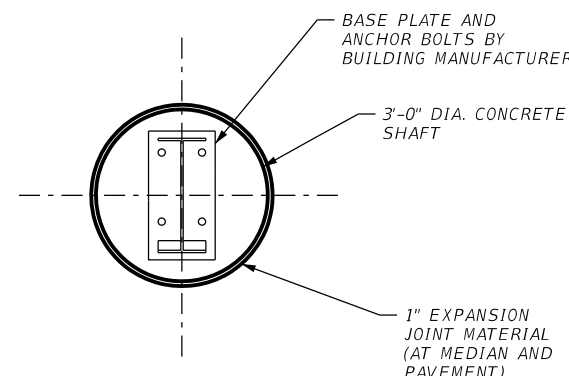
DETAIL N - STATIC SCALE CANOPY TYPICAL SECTION
